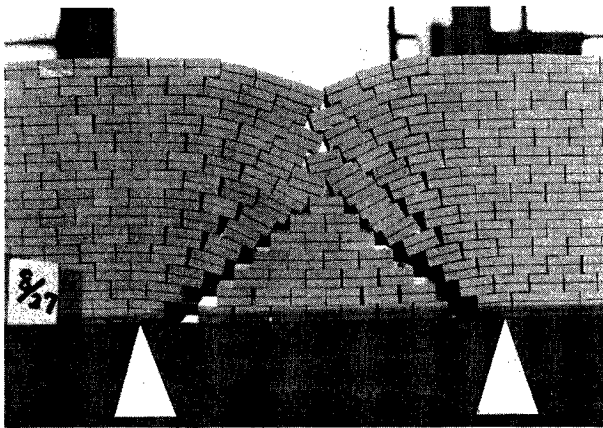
Failure pattern of blocks piled in horizontal strata with symmetrically staggered joint.
